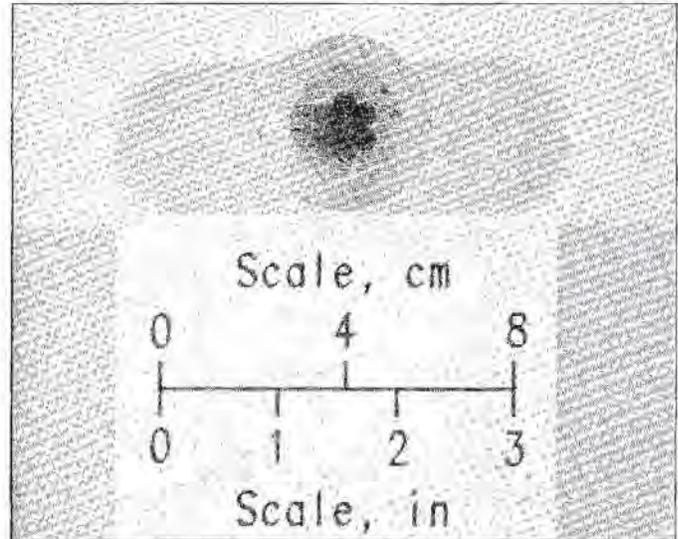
Cross section of a 1.52-cm- (0.60-in-) diameter cable installed in a 2.5-cm- (1-in-) diameter hole.
